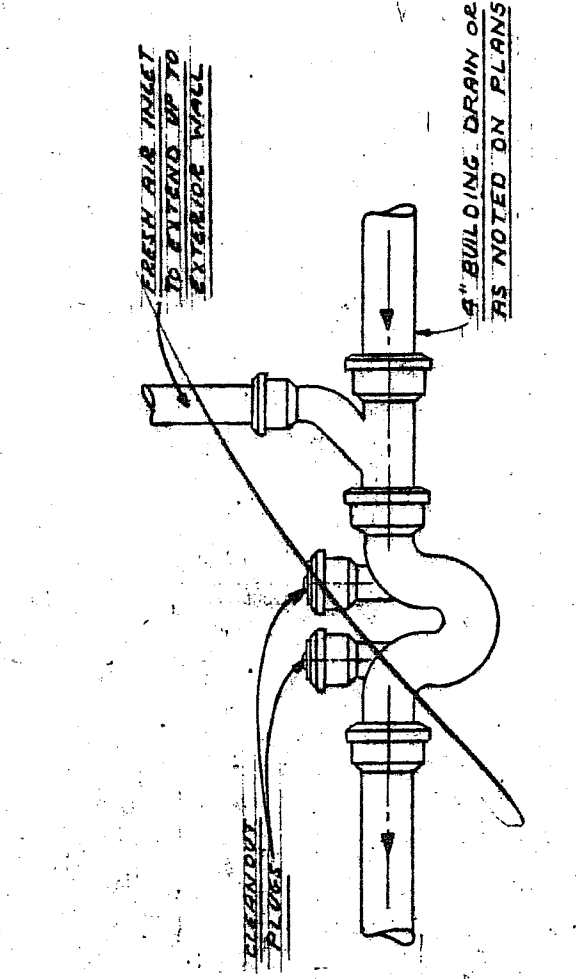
DETAIL - DRAIN @ HWG, EMERG. GEN. BOILER LOCATIONS
